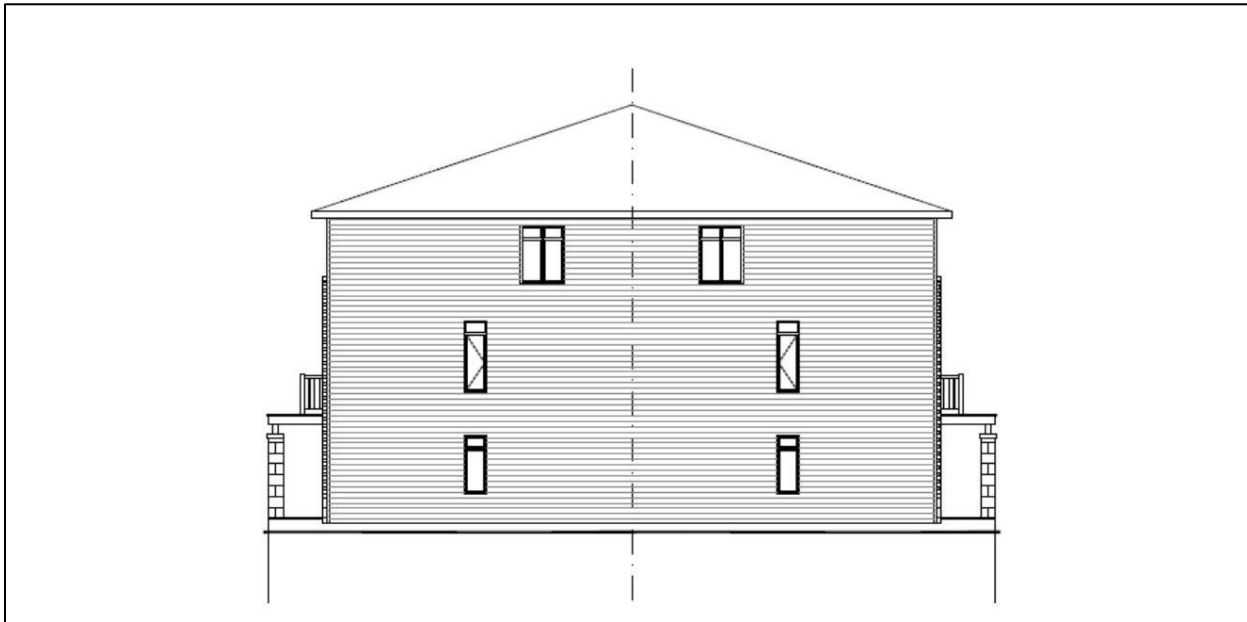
Side elevation of the back-to-back townhouse block by Claridge Homes.
